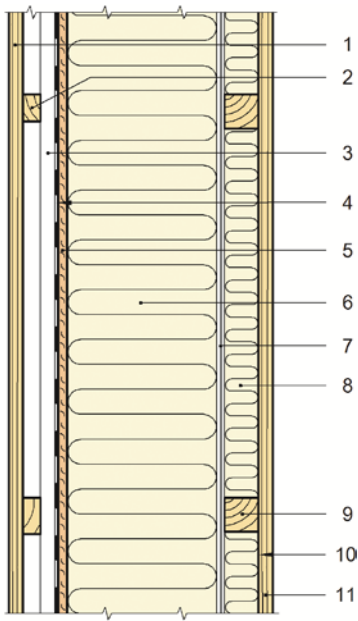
Shows the principle design of standard external wall with vertical wood cladding.
